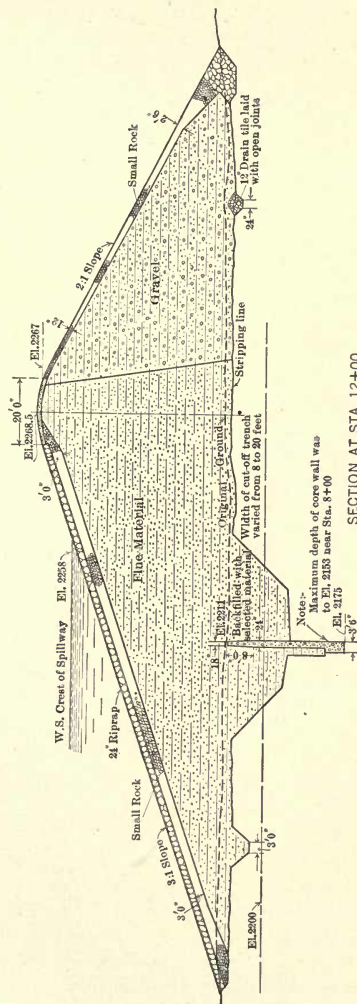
Section of Kachess Dam, Yakima Project, Washington.
